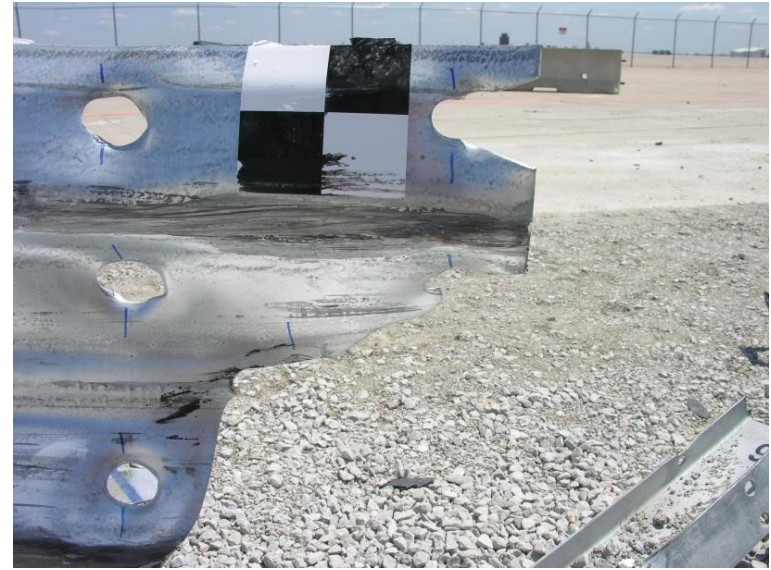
Rail Pocketing and Rupture, Test No. MWTC-1
